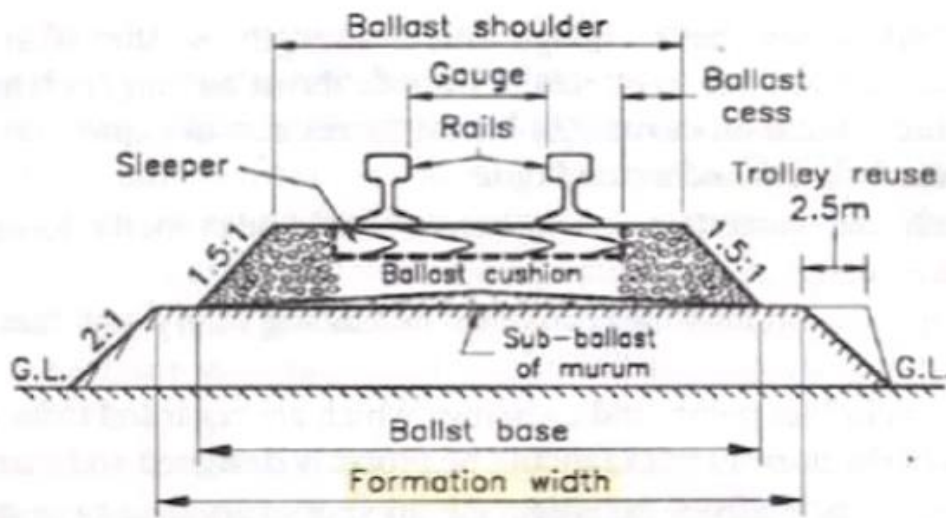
Typical Cross-section of a Permanent Way on Embankment.
